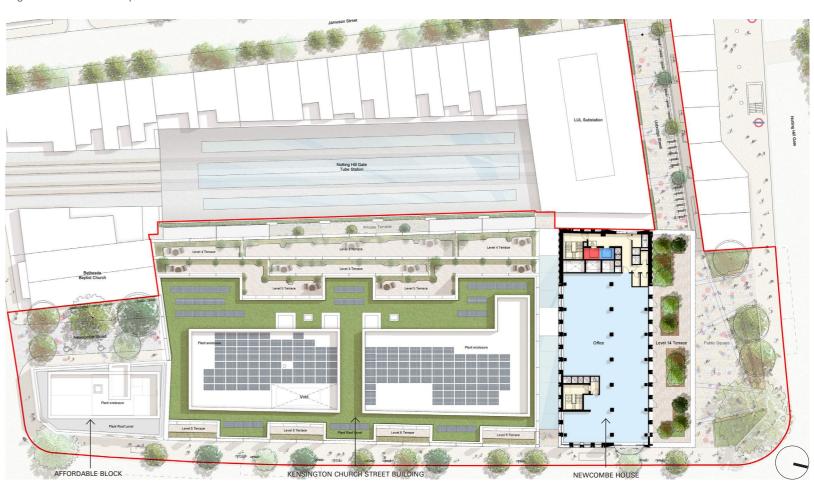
Illustrative Proposed 14th Floor Plan
